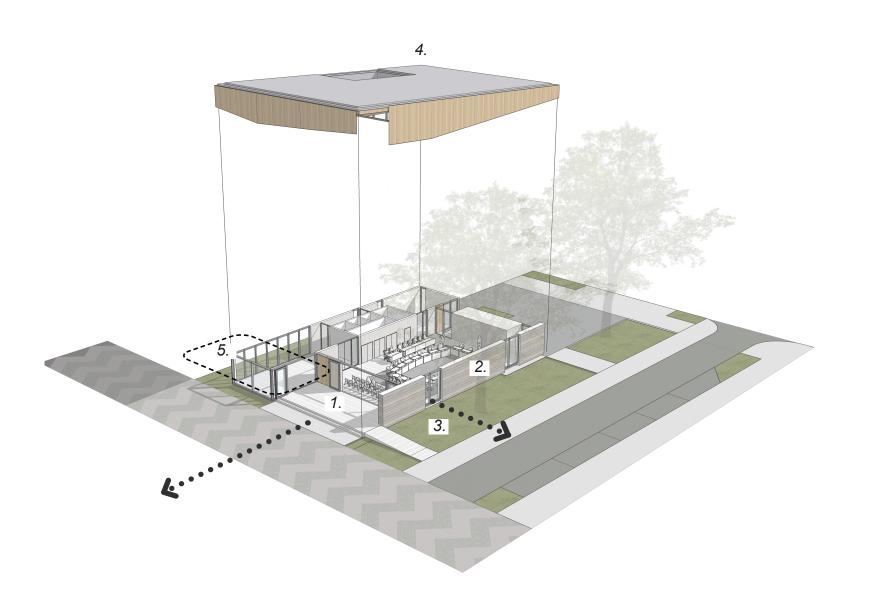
Exploded axonometric of the chambers building with references to the key design moves.
